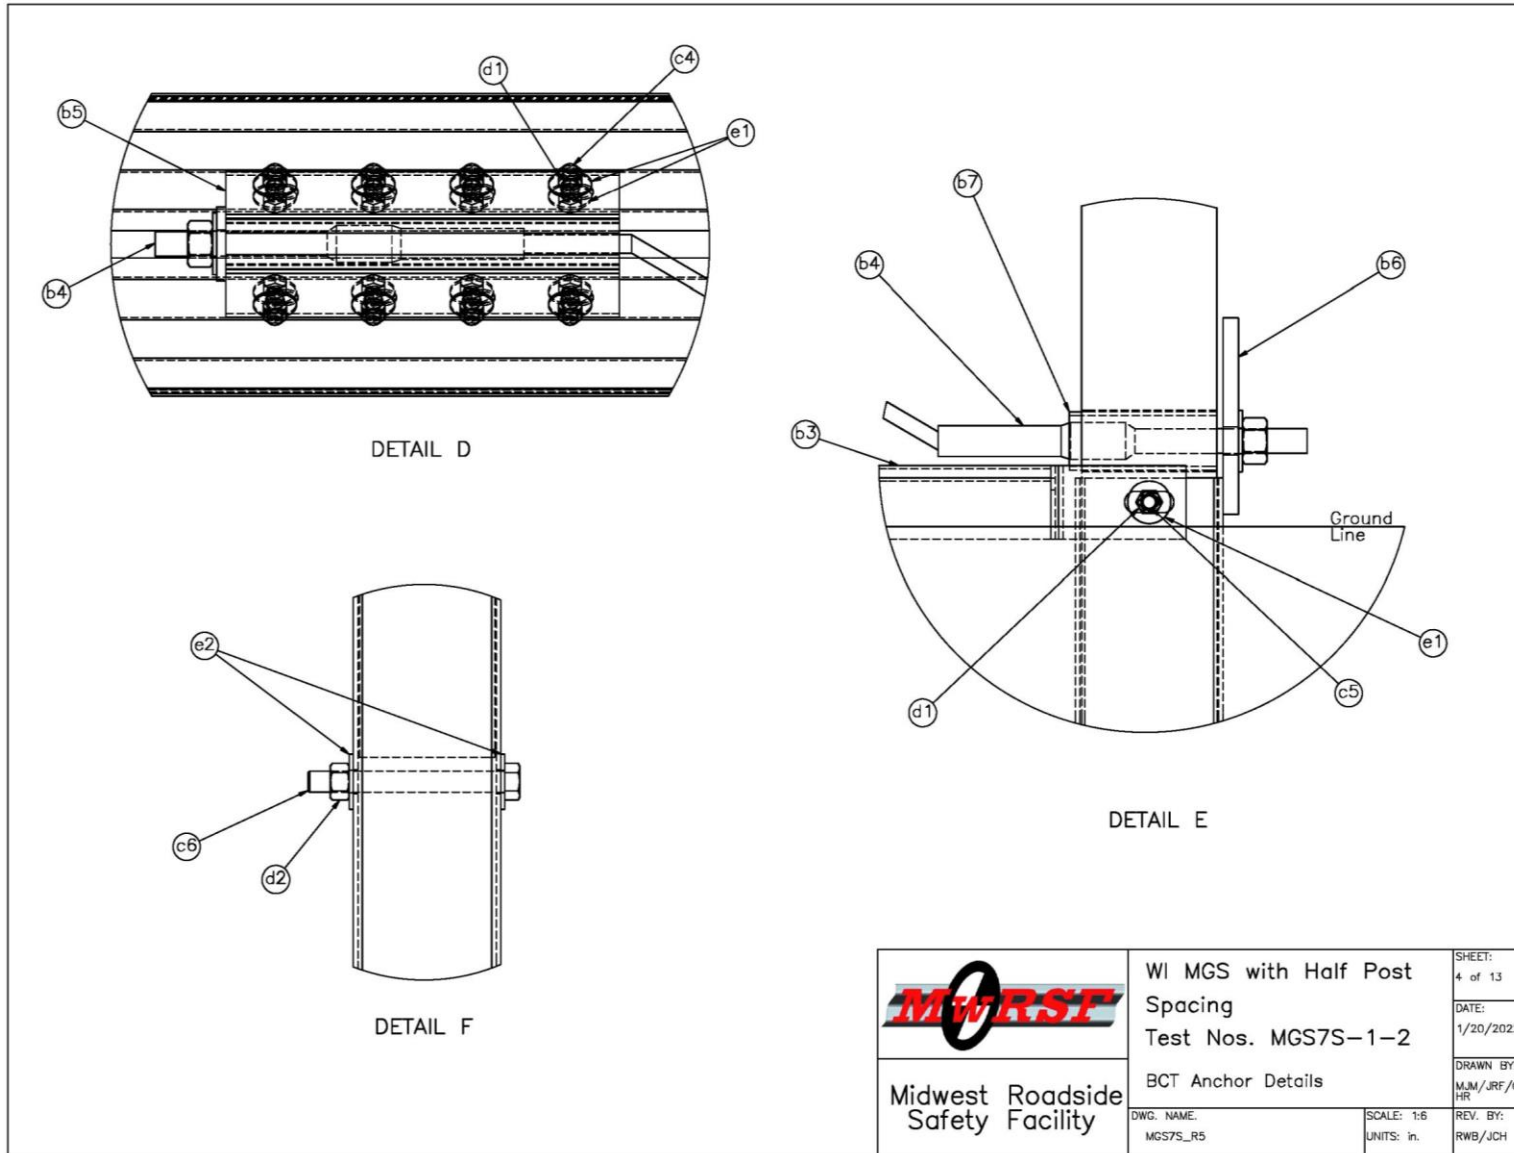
BCT Anchor Details, Test No. MGS7S-1 and MGS7S-2
